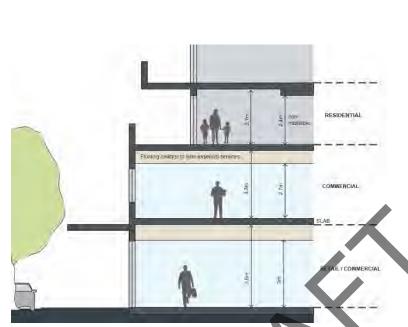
Minimum Floor to Finished Ceiling Height Explained (Figure inserted January 2016)
